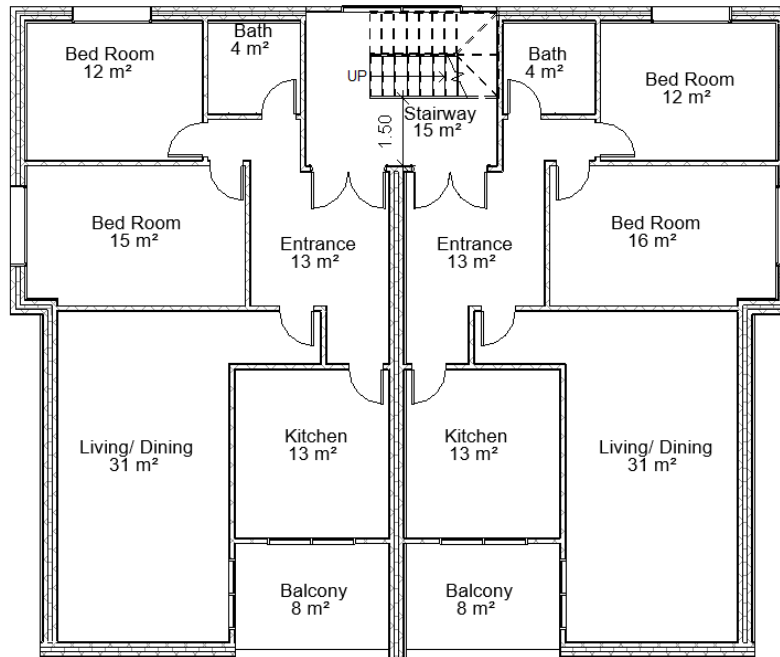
Typical plan to be used for simulations for balcony structure surrounded by 3 walls overlooking the west orientation, Source: Author
